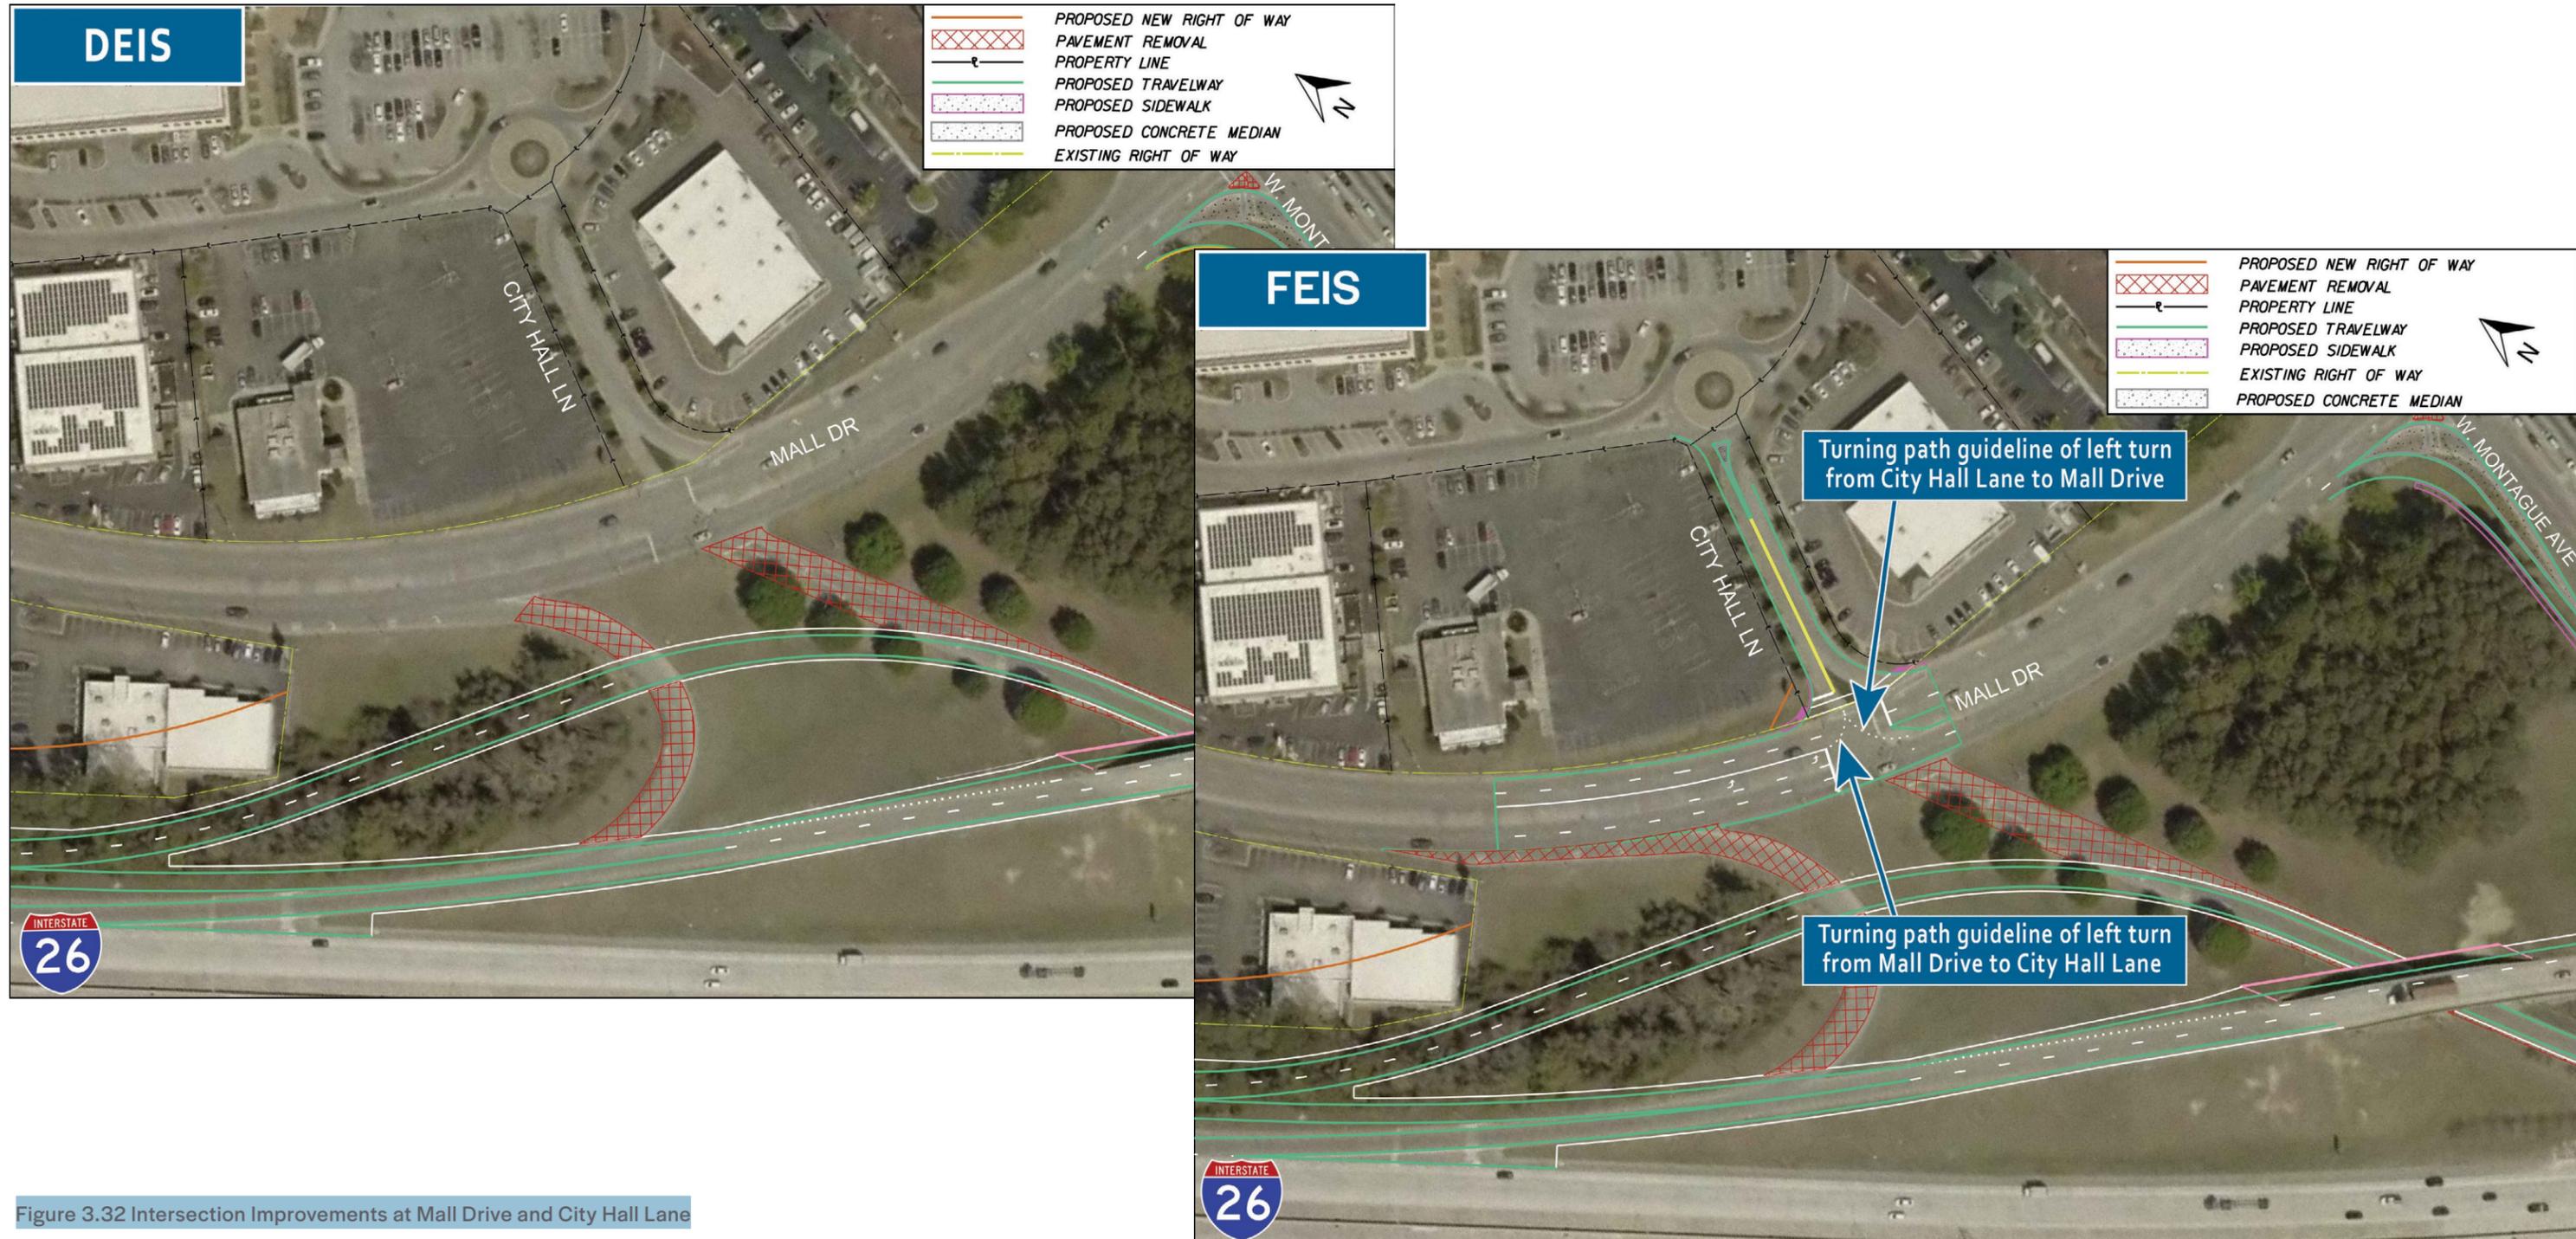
Intersection Improvements at Mall Drive and City Hall Lane
